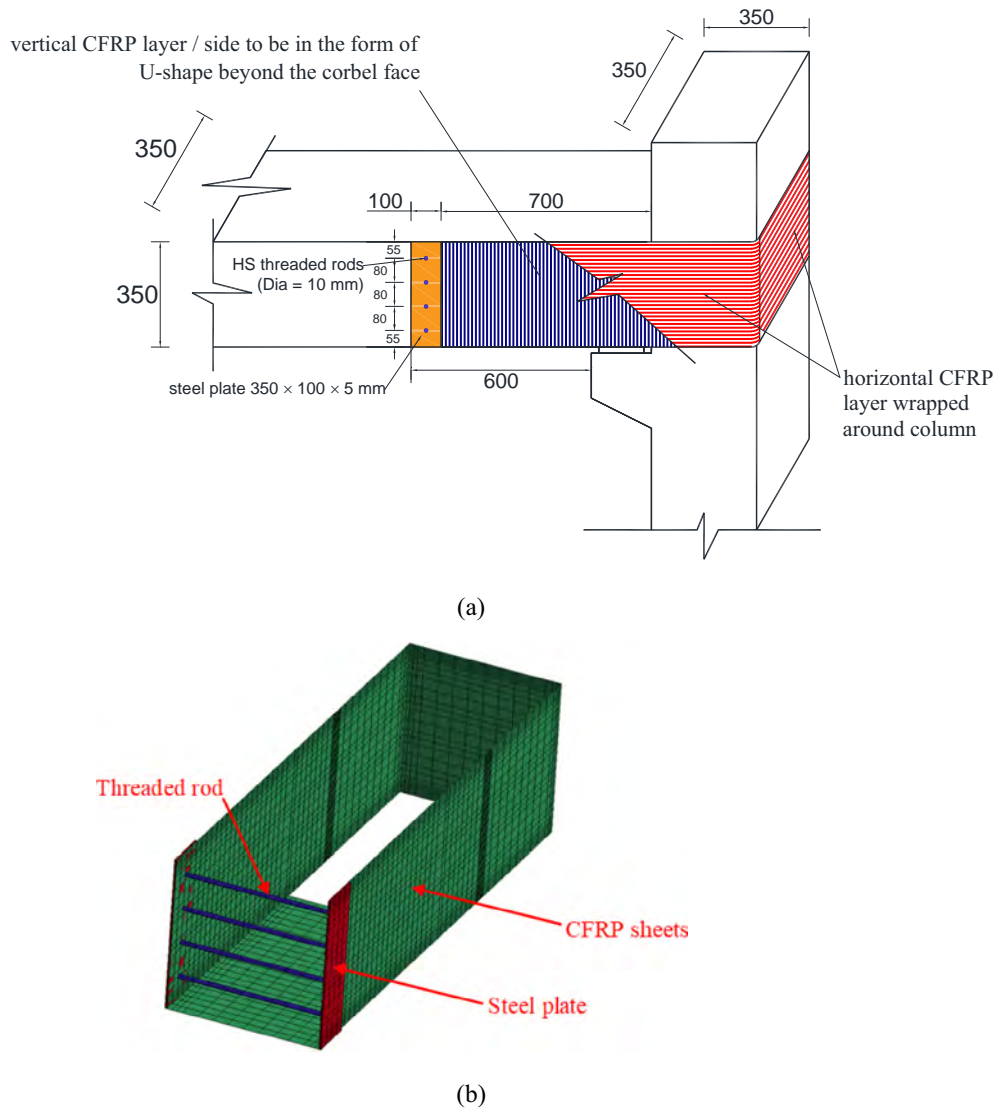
Anchorage details for outer joint zone of strengthened specimen PC-S-EA: (a) Strengthening details (All dimensions are in mm); (b) FE model of anchorage system.
